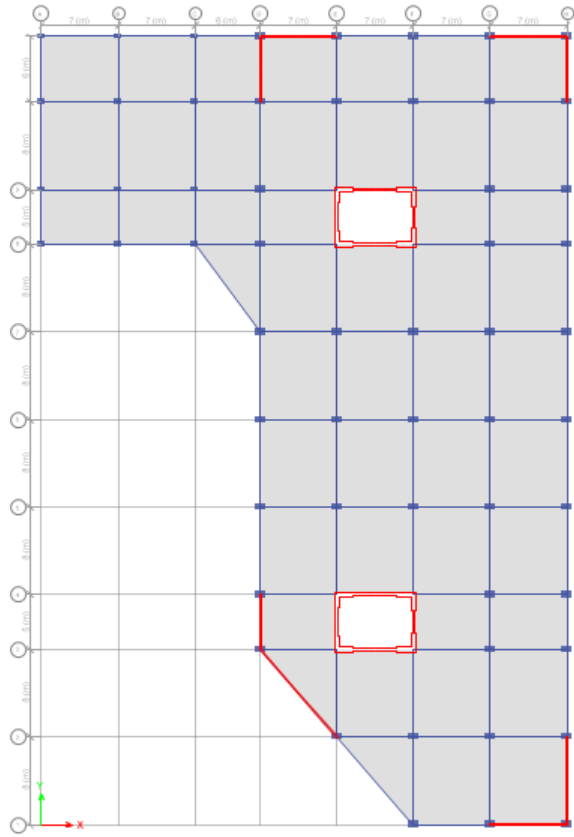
Typical Floor Plan: from base to 12 story level : Shear wall At Corner portion
